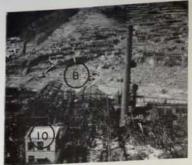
4,300 feet from GZ. Group 26, Building 41. General view, looking north. Corrugated siding and metric was stripped, but the building was structurally undamaged.
